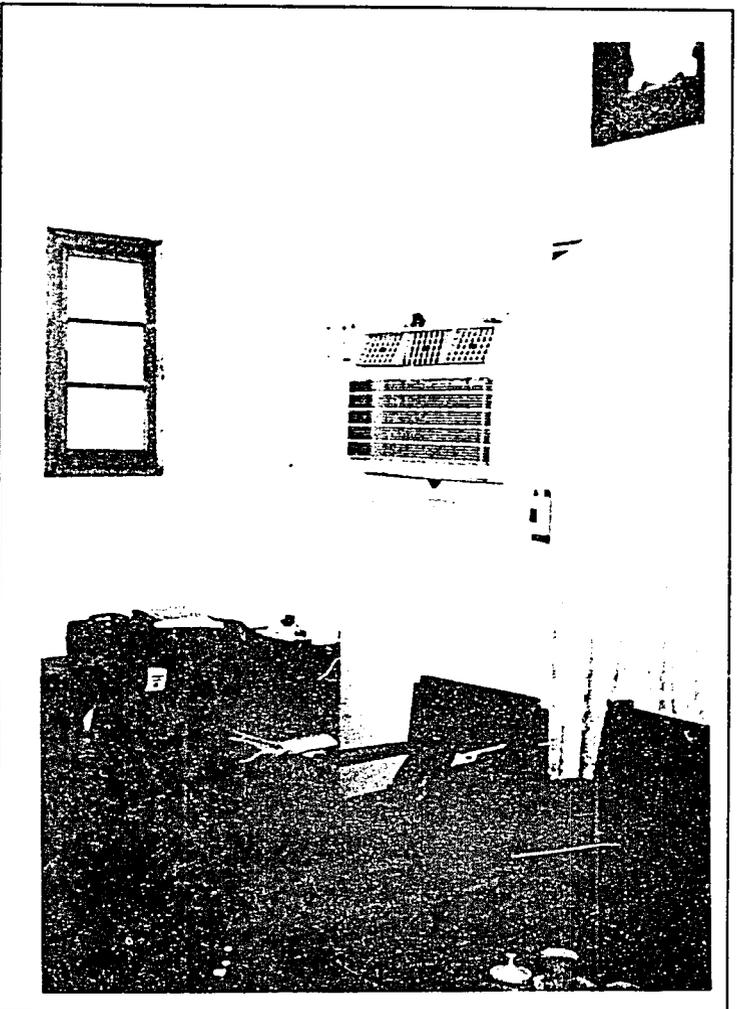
Quetta AID/REP Office Facility. View of northwest corner of AID/Rep's office.
